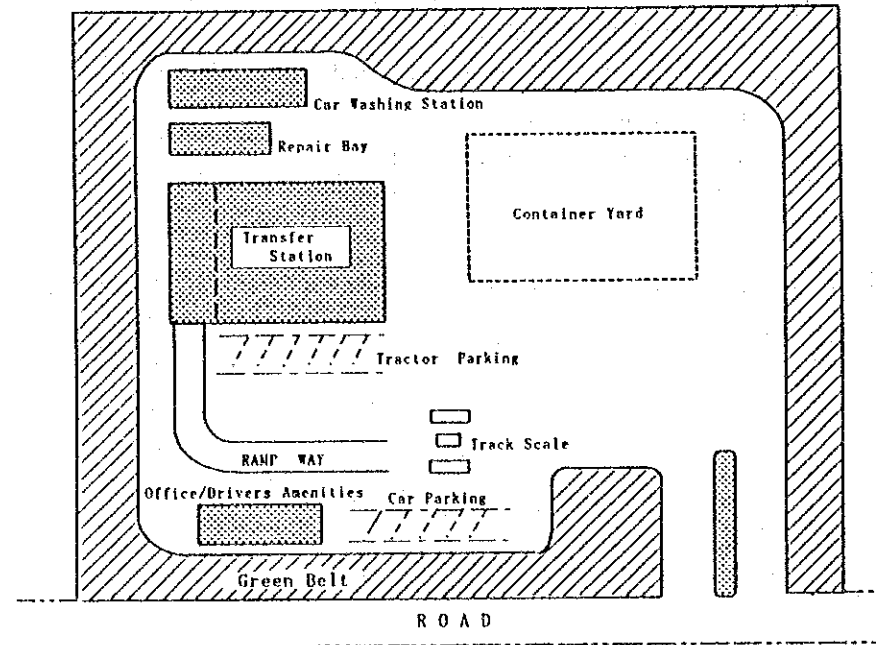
Plan of Transfer Station (Indirect Re-Loading Type)
